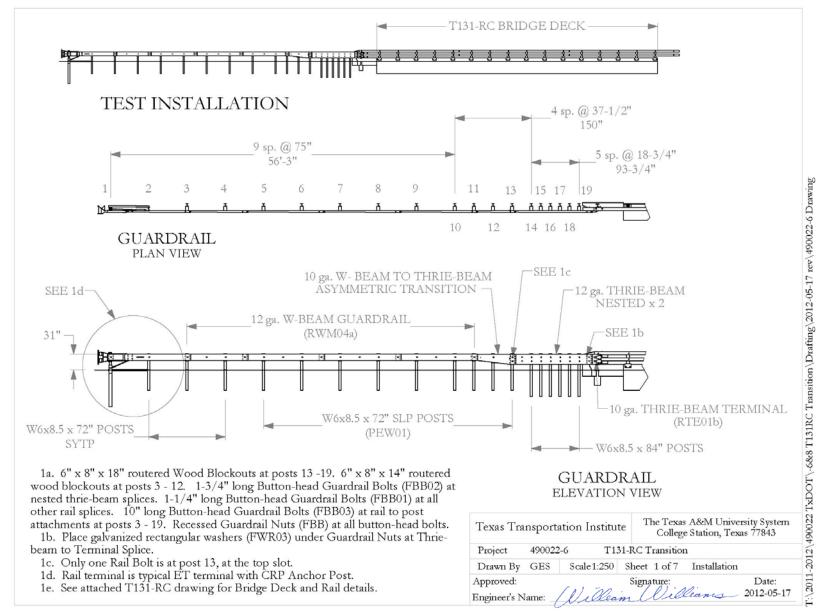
Details of the TxDOT T131RC Bridge Rail Transition Installation.
